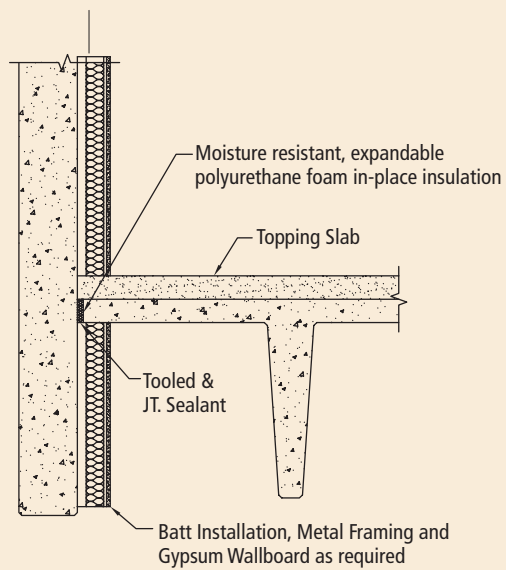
Typical floor detail – alternate batt insulation.
